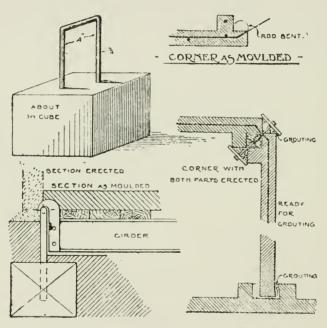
DETAILS OF CONSTRUCTION FOR A FARM BUILDING.
